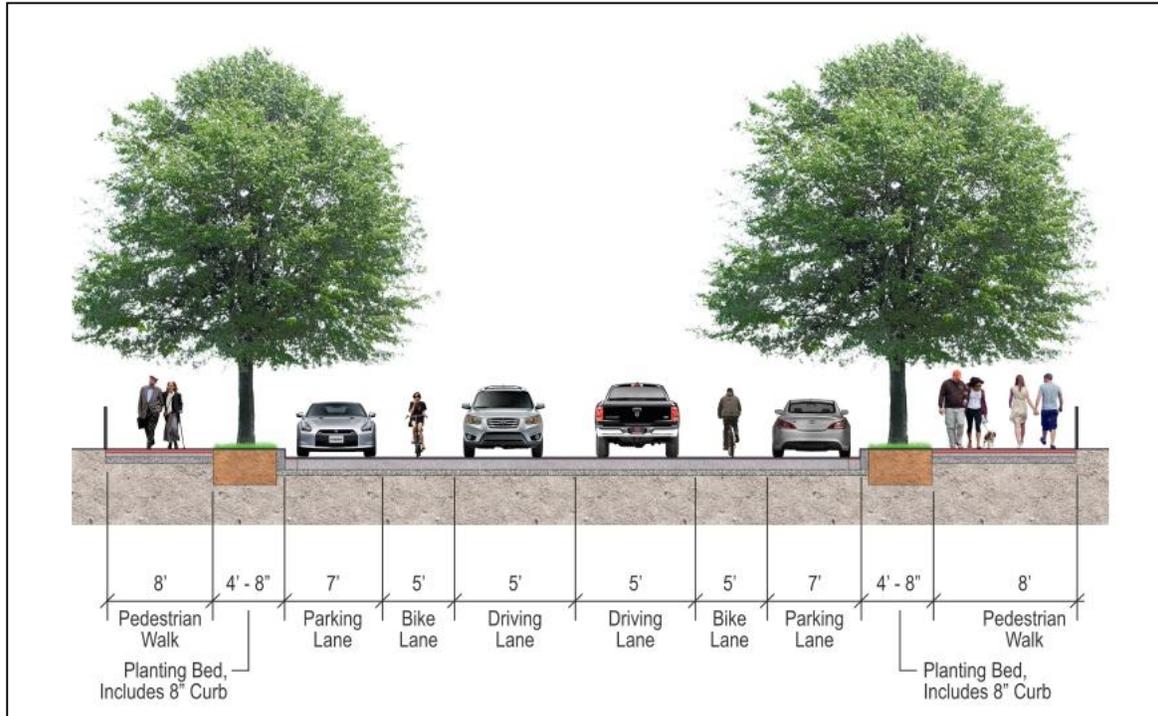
Proposed New Jersey Avenue SE Typical Section between E and D Streets SE
